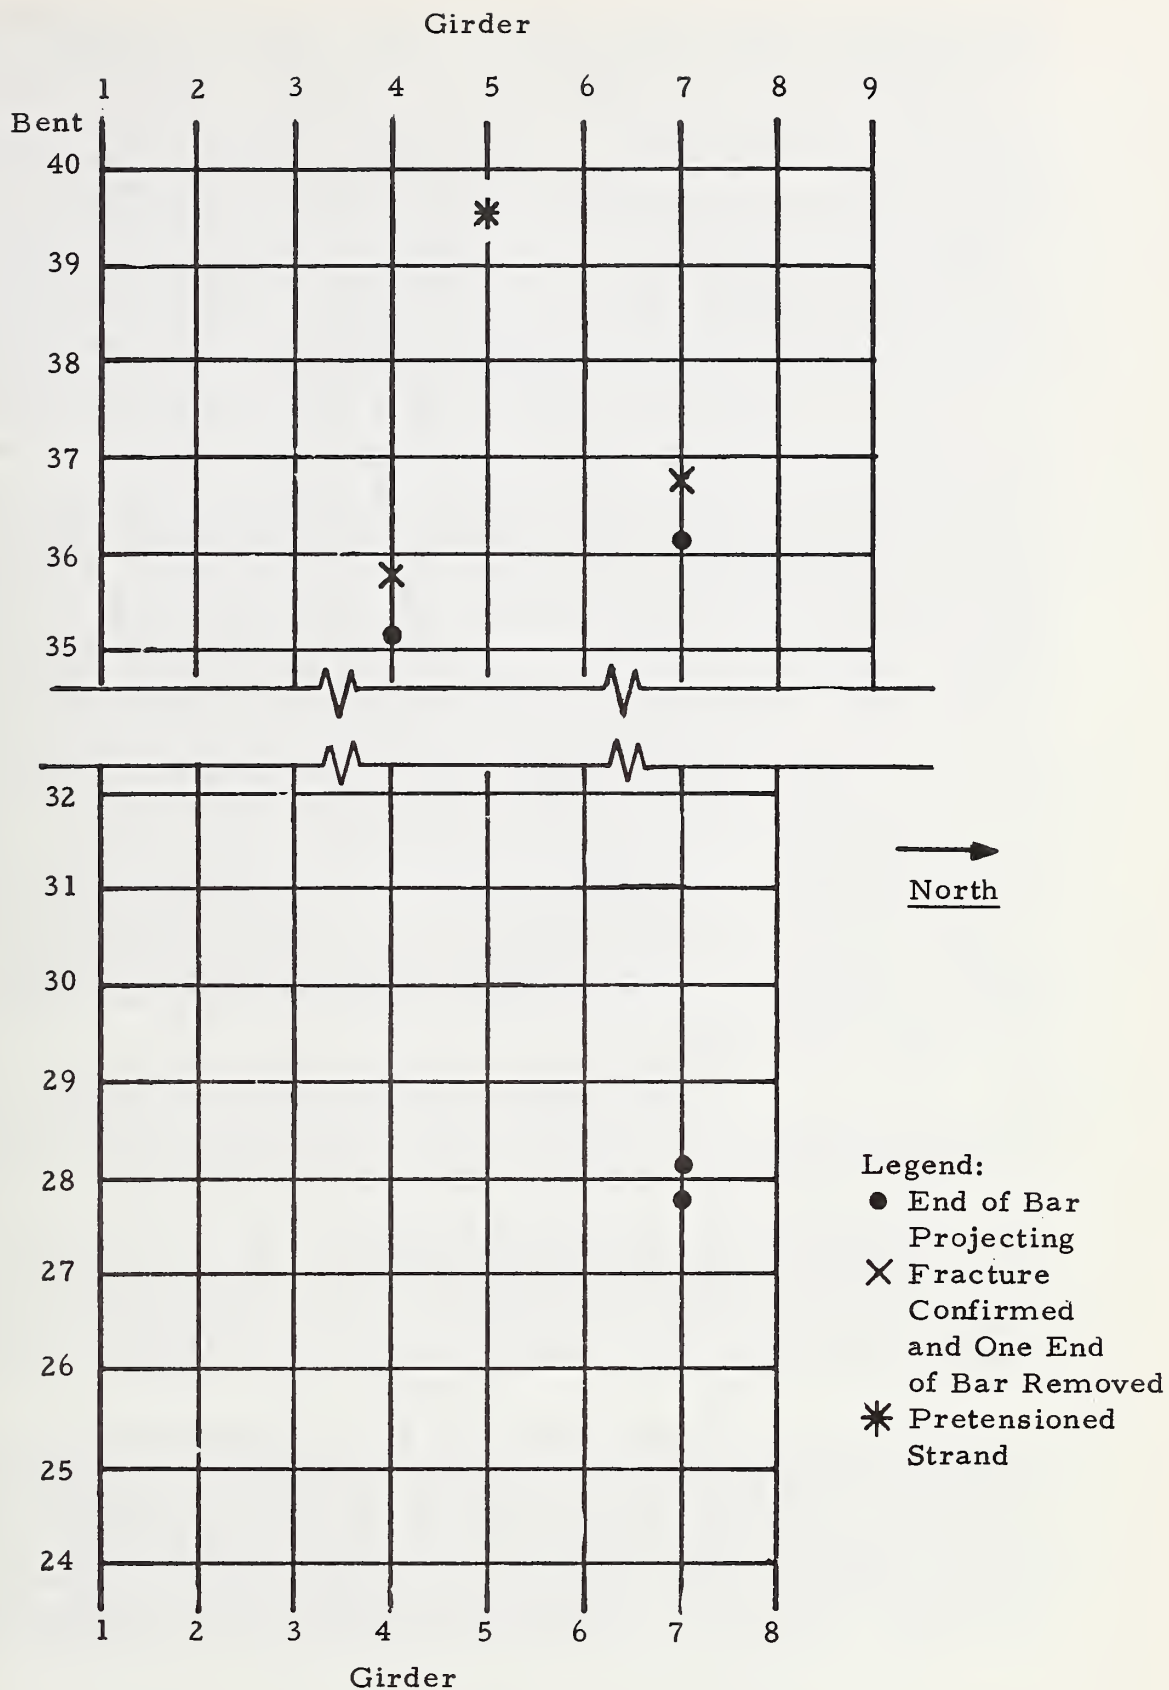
LAYOUT OF SIXTH SOUTH STREET VIADUCT SPANS SHOWING LOCATION OF GIRDERS INSPECTED
